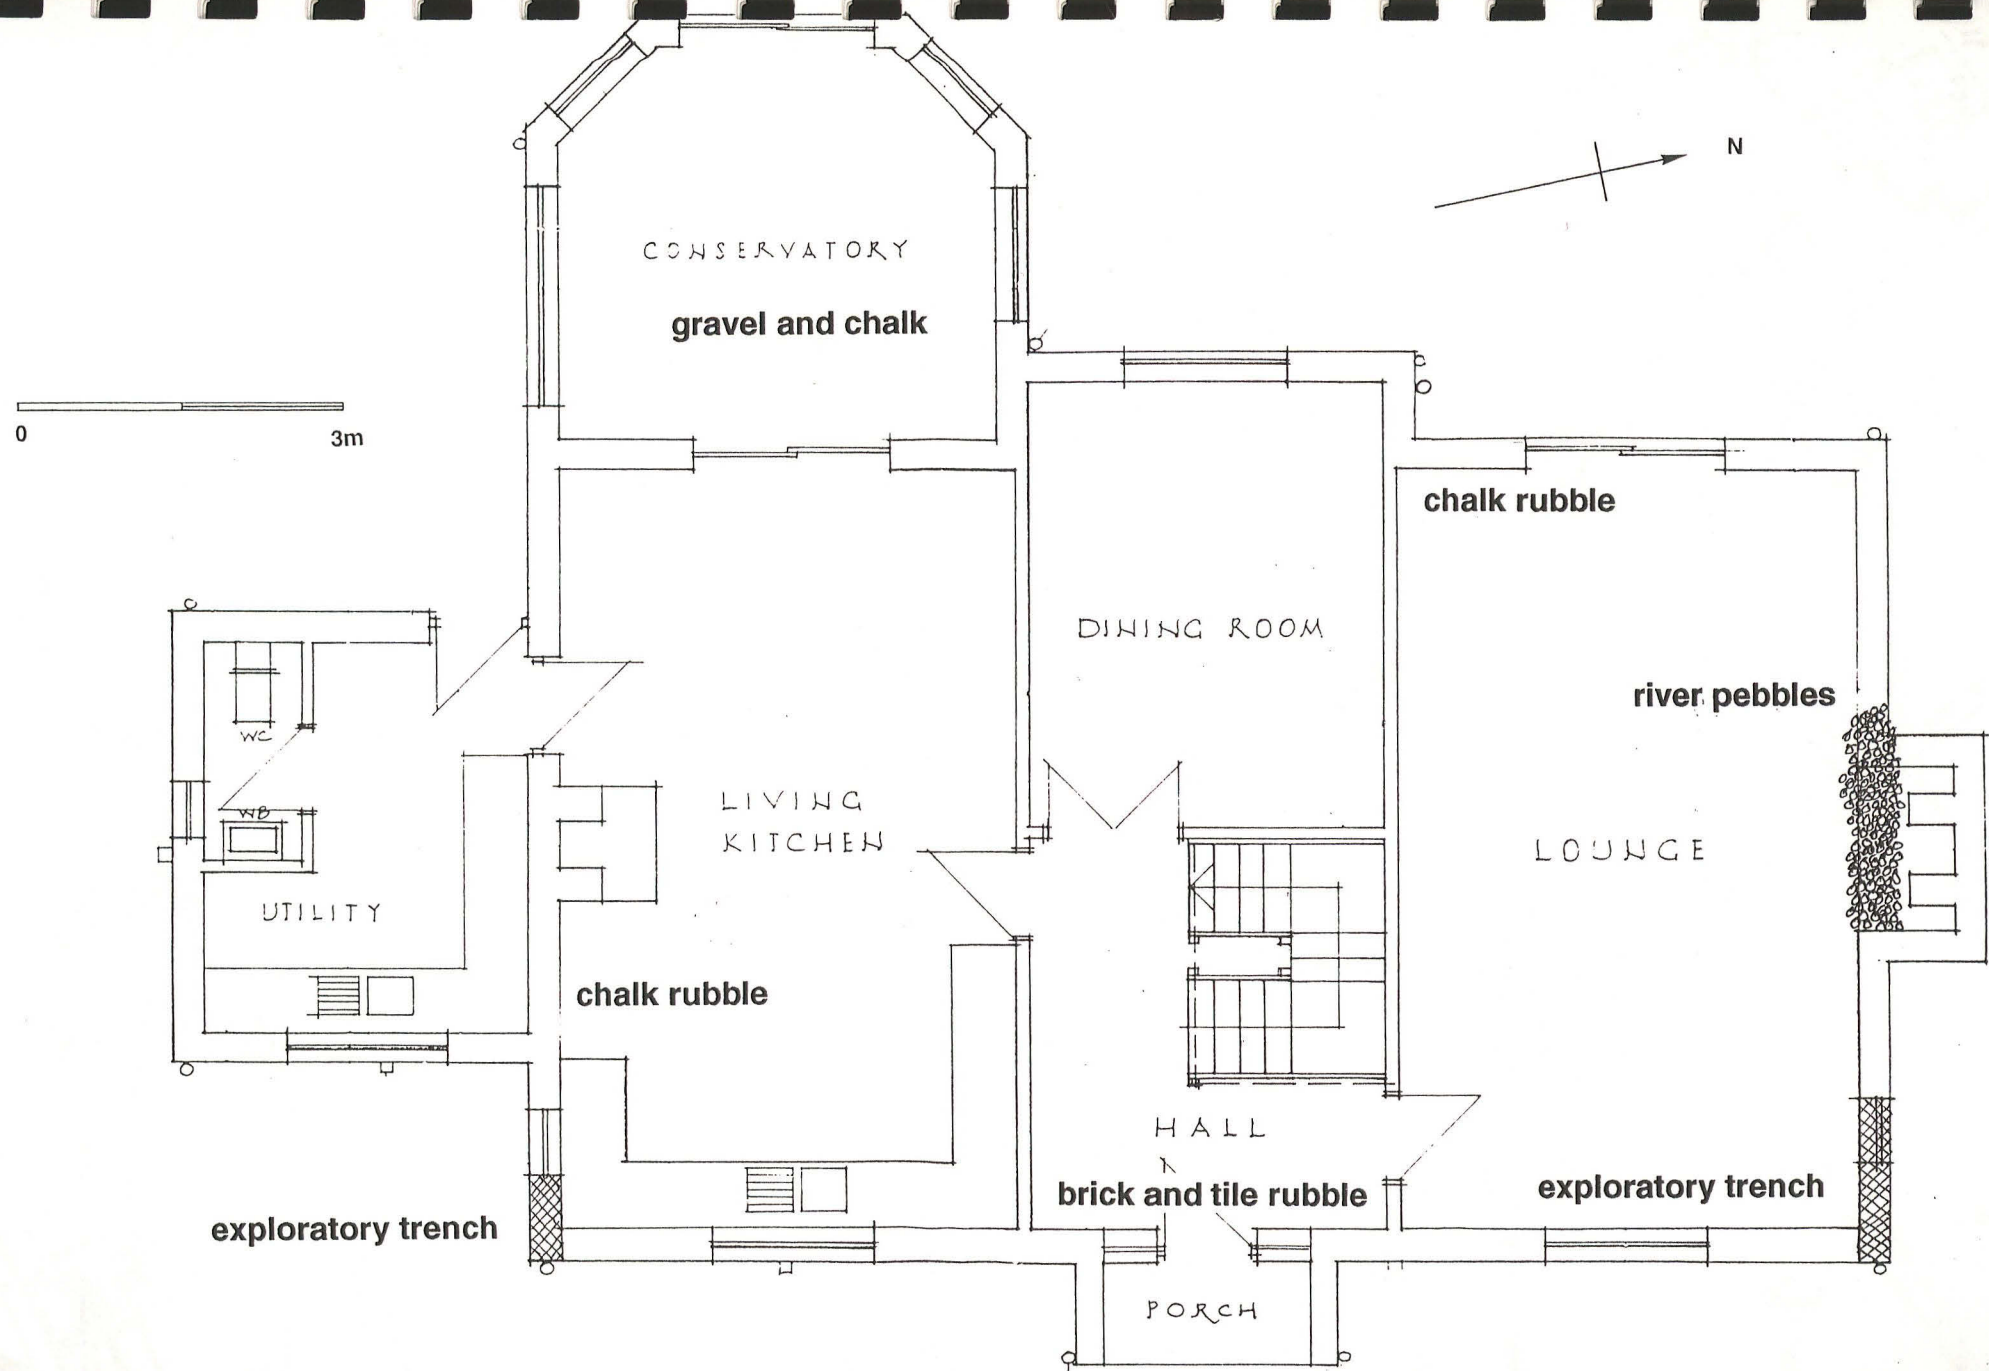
Plan of the Ground Floor layout of the new building, showing the position of observations noted in the text (reproduced from the Ground Plan [Dwg. D 7.97.6] produced by J.S. Grant for the client).
